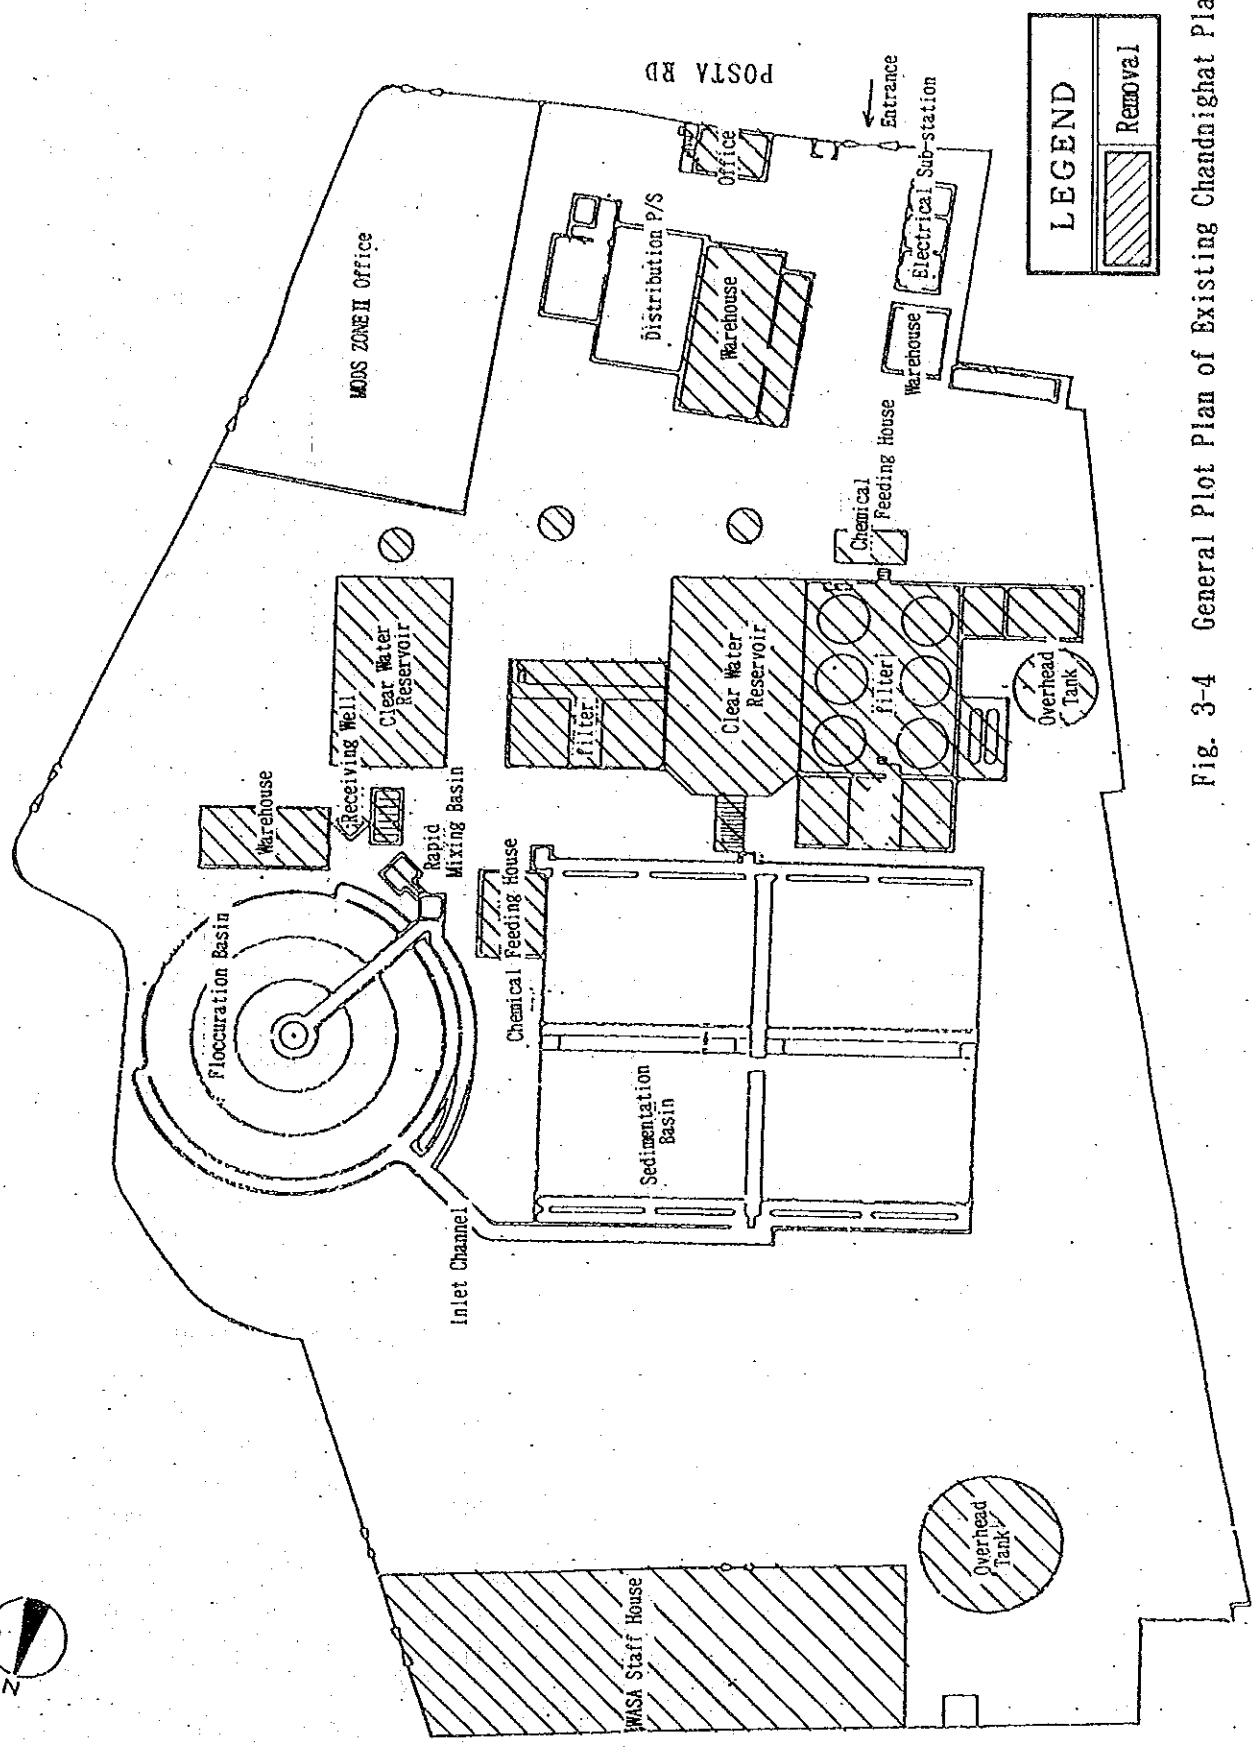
General Plot Plan of Existing Chandnight Plant.
